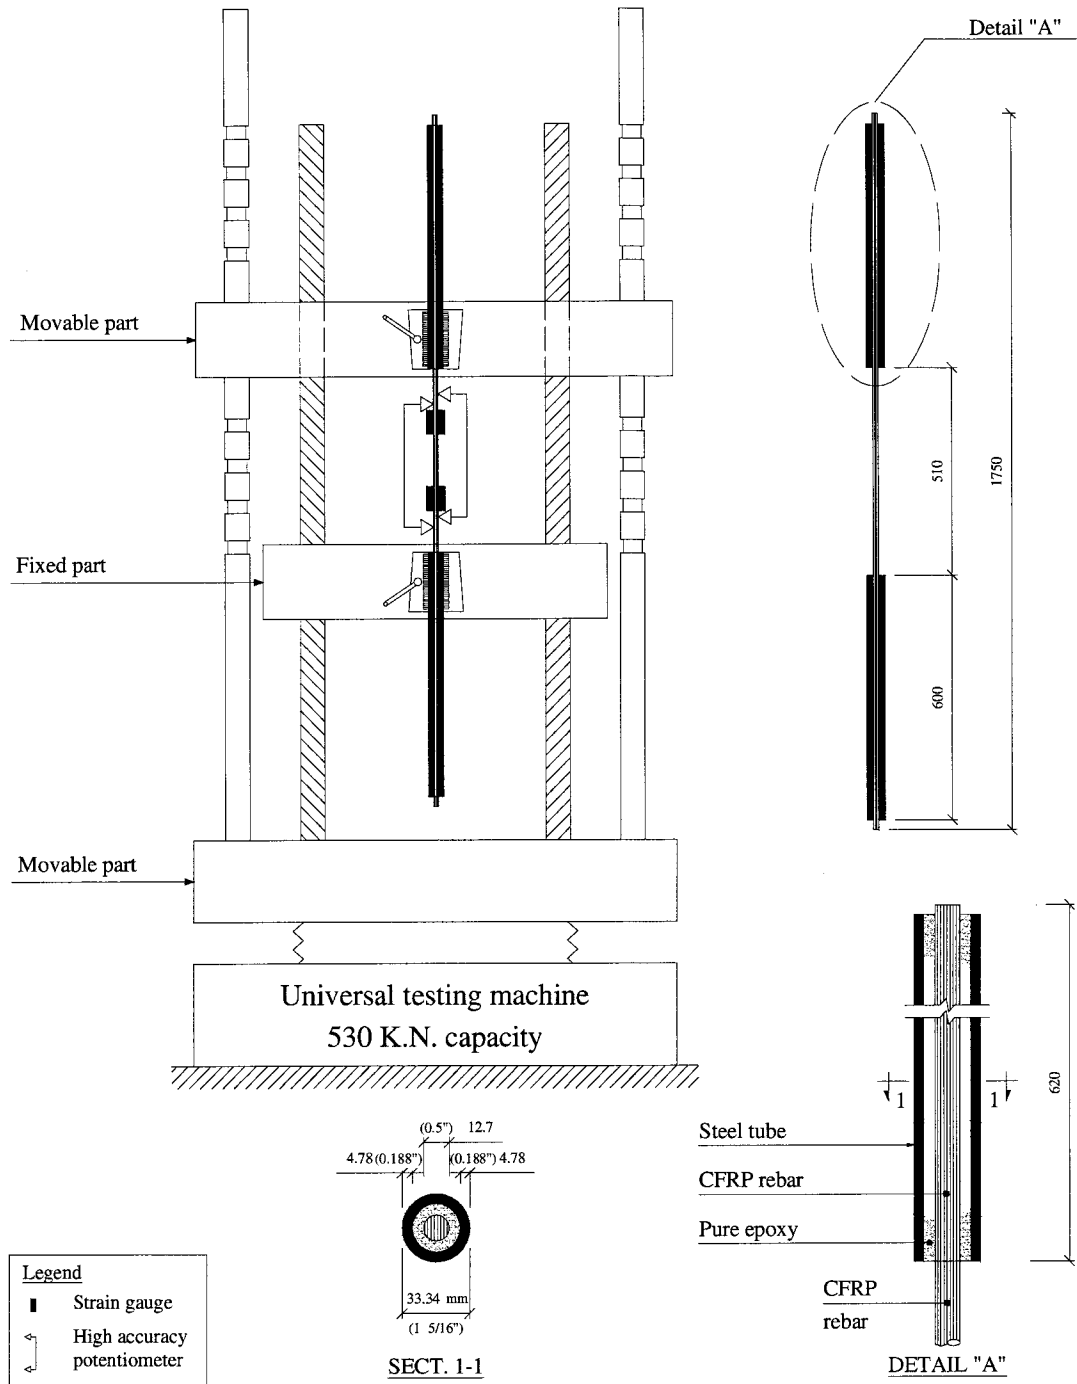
Specimen details, test setup, and instrumentation of mechanical properties test
